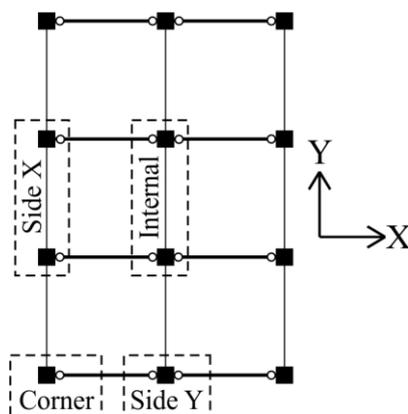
Plan view of the case study building from ST-L1 assessment
